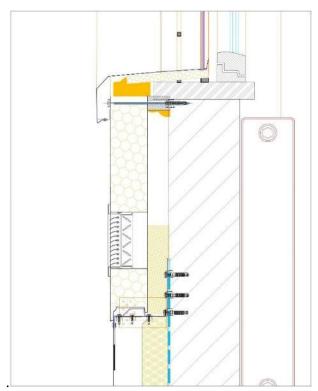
Preliminary design of ventilation grilles dependent on the final manufactured façade panel.
